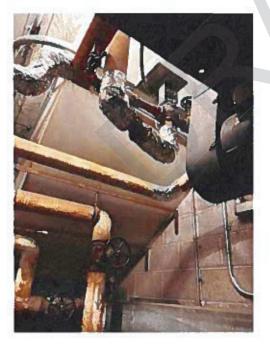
Existing (Damaged) Hot Water Heating Piping Insulation
